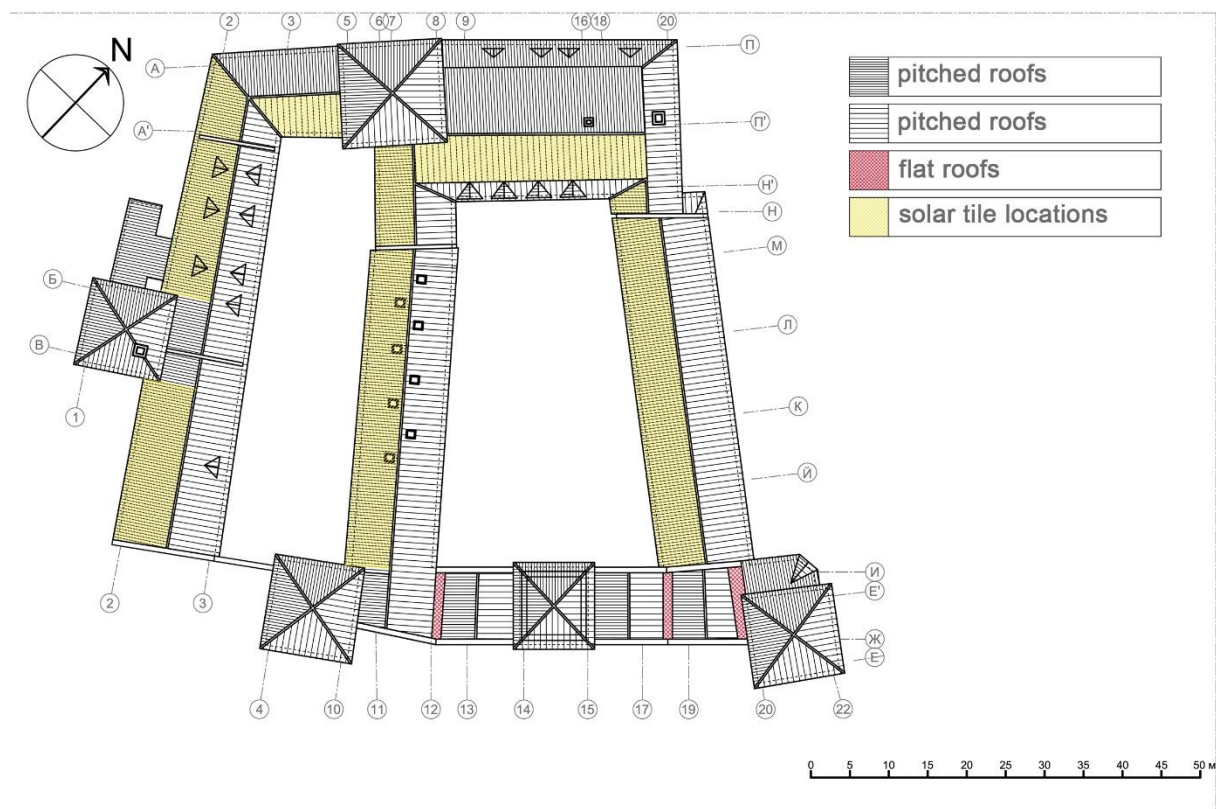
The plan of roof with the recommended locations of solar tiles.
